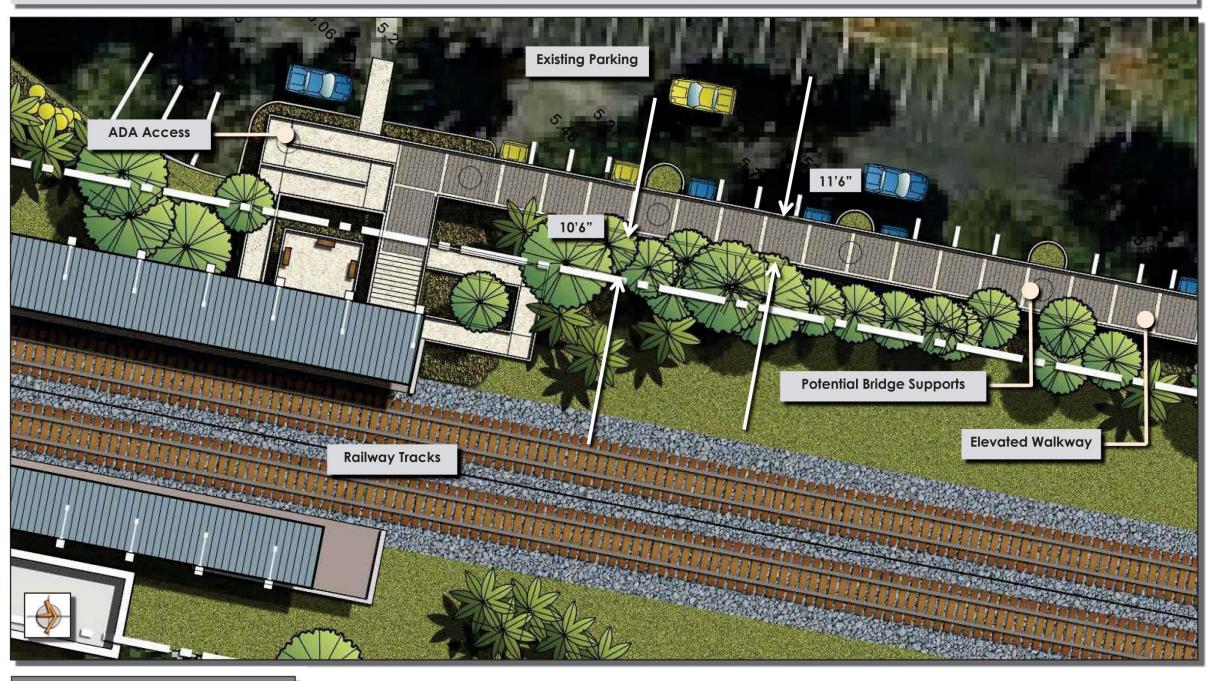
Elevated Walkway from Cypress Creek Tri-Rail Station (Northern Section)
